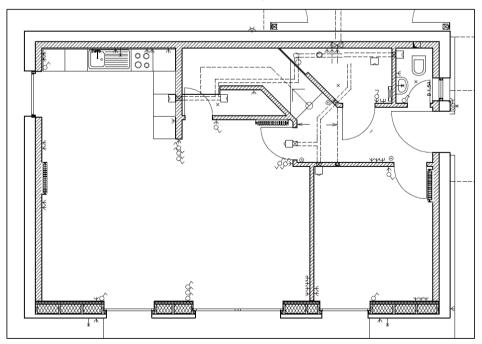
Floor plan of ground floor (source: Benjamin Wimmer)
